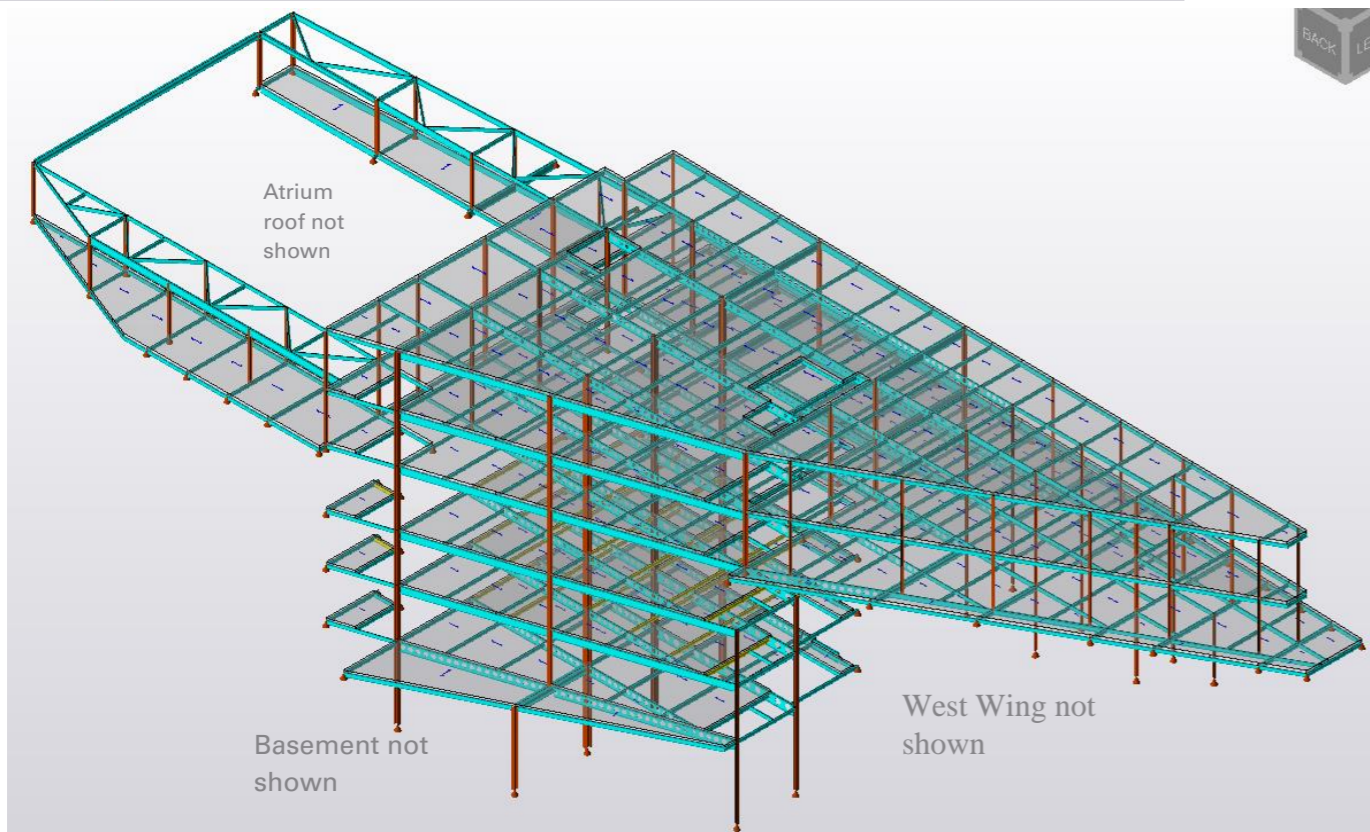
and 14b: Tekla Structural Designer models of steel frame. Basement and atrium roof not shown.
